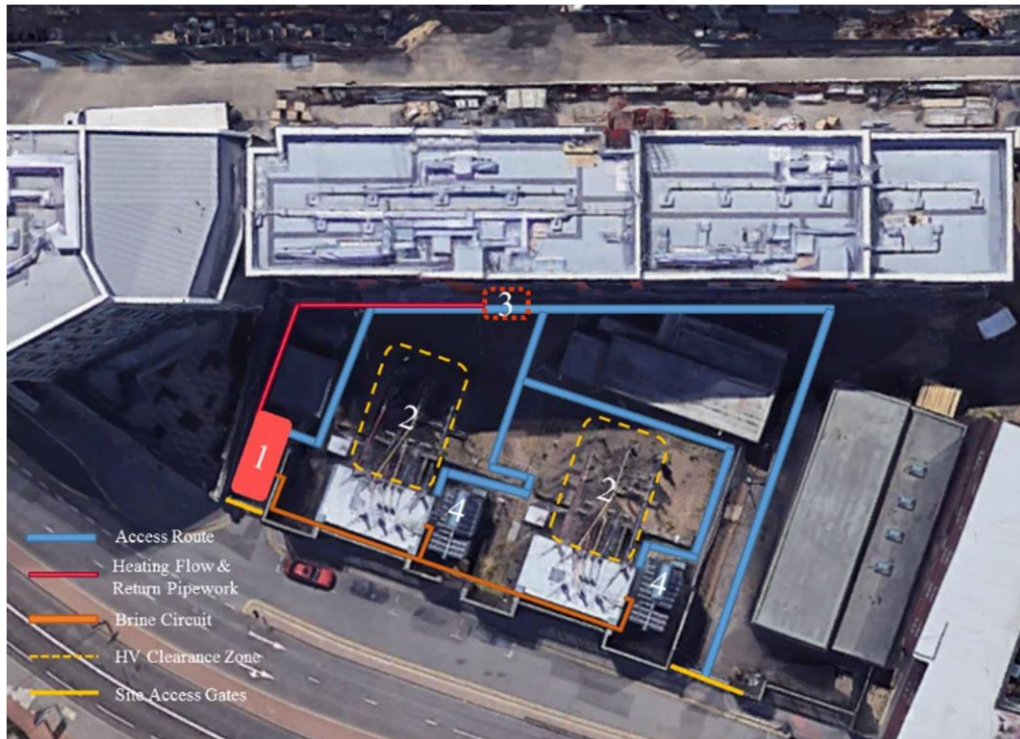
Barrack Road Heat Recovery System Site Plan (image courtesy of Google Earth®)
